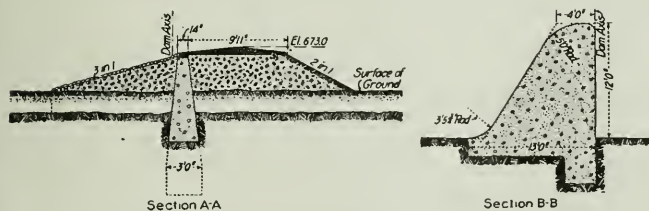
Sections of Sooke Lake Dam and Earthfill.
